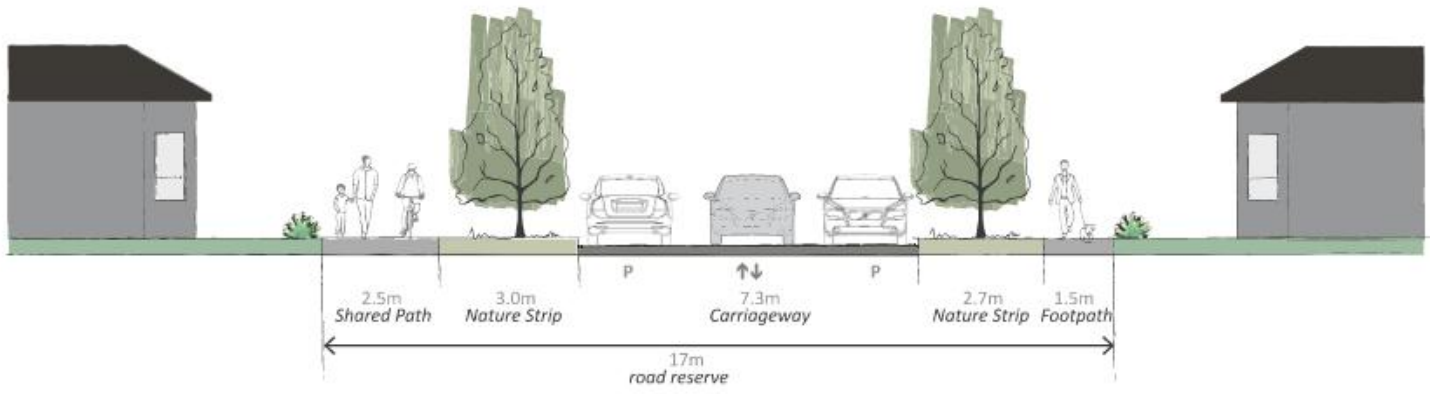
D - Internal/Perimeter Street Cross Section – Local Access Street Level 1 (17m)
